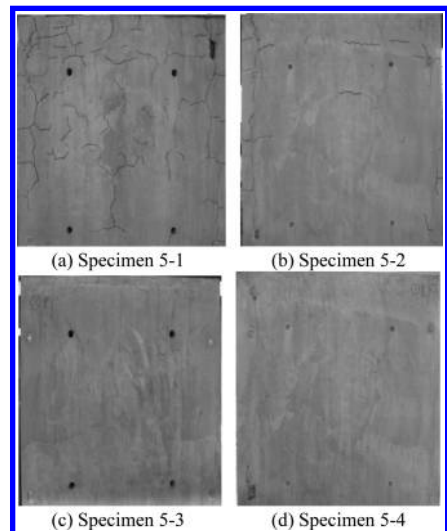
Influence of different structure measures on light gauge steel and foamed concrete wall cracks.
